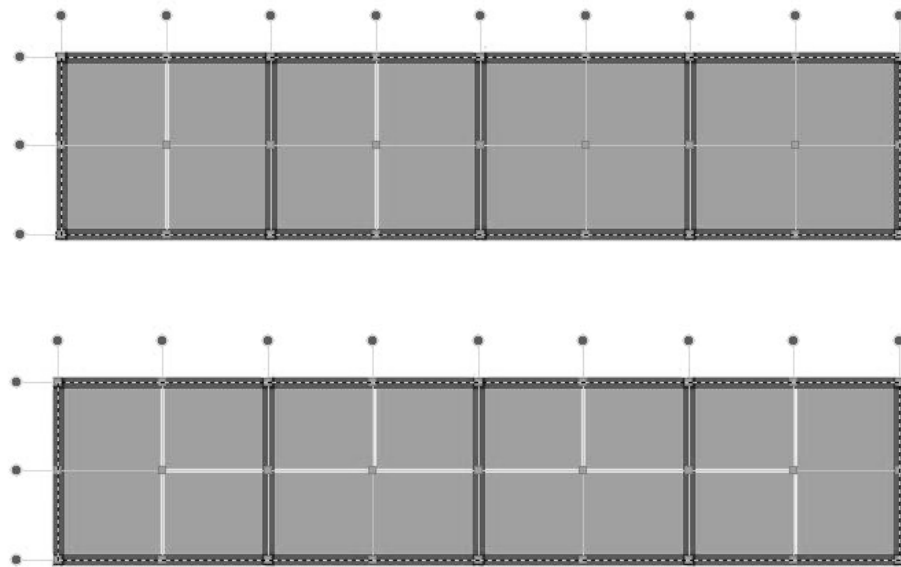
2D Model for K7 Building with Infill Walls (1st and 2nd story)
